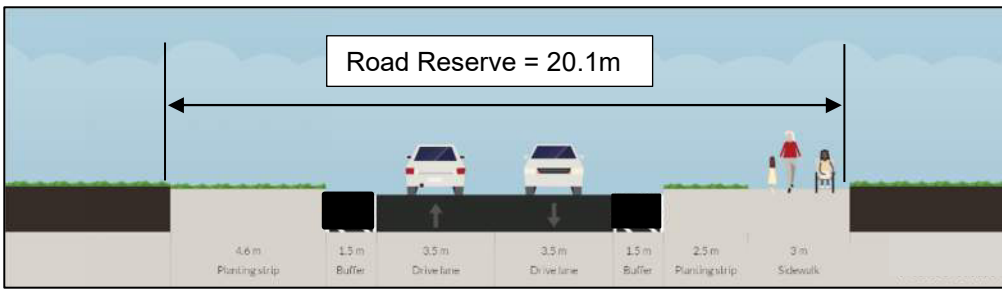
Proposed Cross Section for Lamb Street and Cambridge Road
